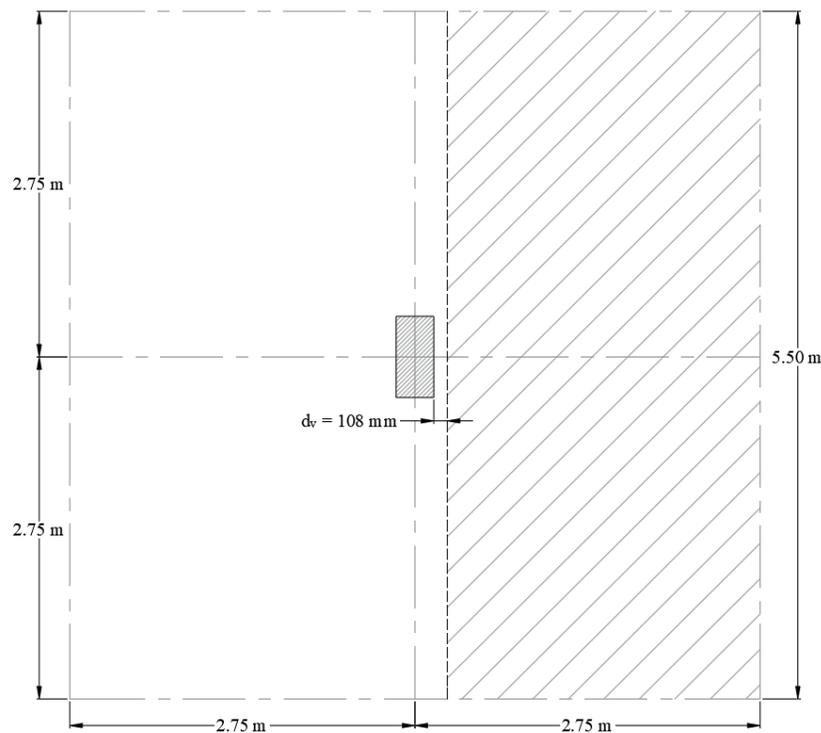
Critical Section for One-Way Shear (Slab without Opening)
